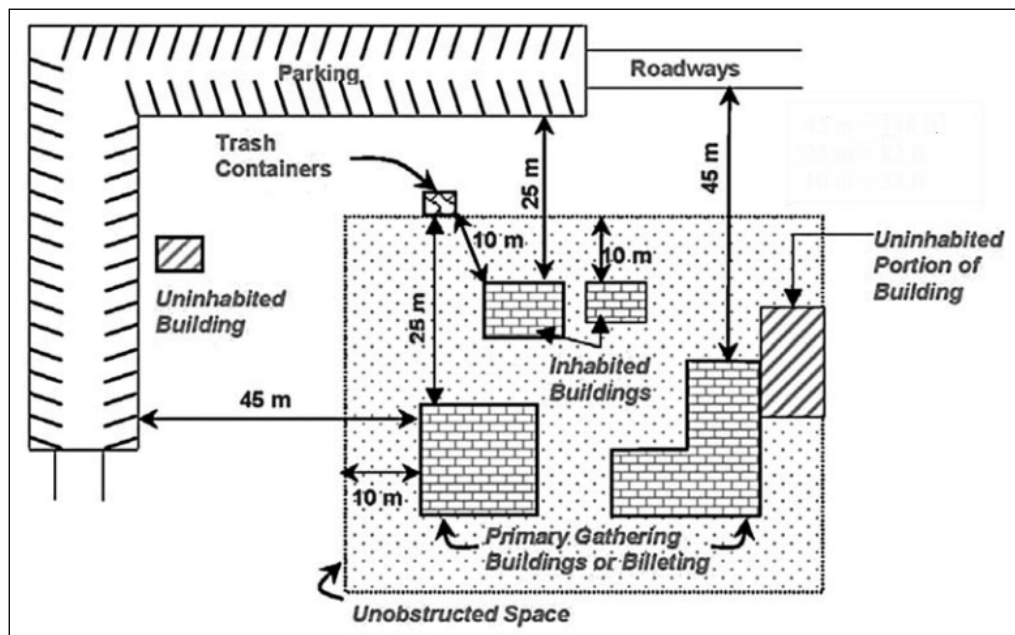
Minimum Standoffs for Buildings of Conventional Construction Without a Controlled Perimeter according to DoD 2007a<sup>[1]</sup> specifications
